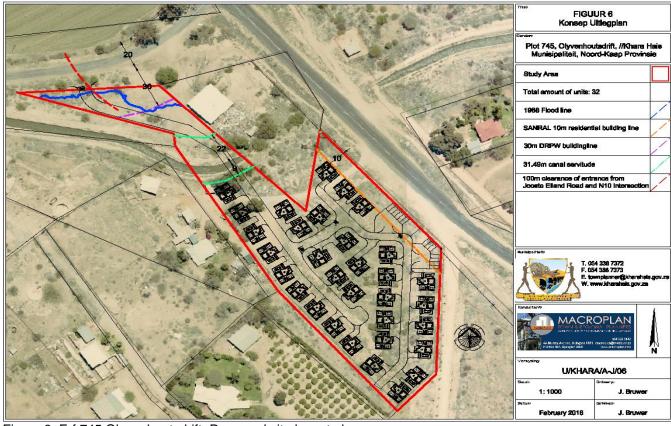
Erf 745 Olyvenhoutsdrift. Proposed site layout plan
